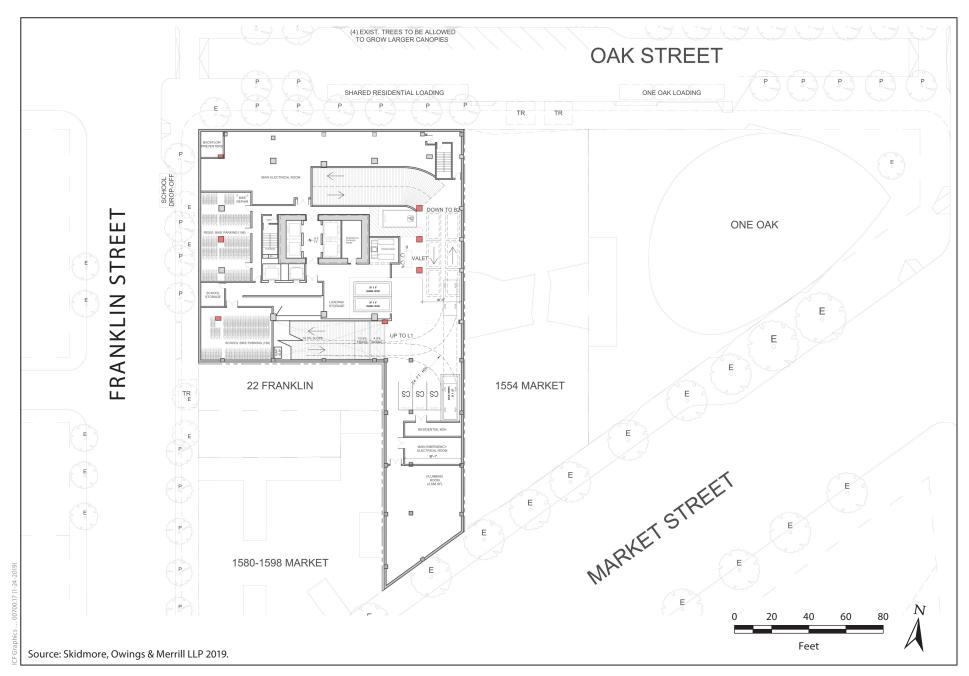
98 Franklin Street Project – Proposed Basement Level 1 Plan
